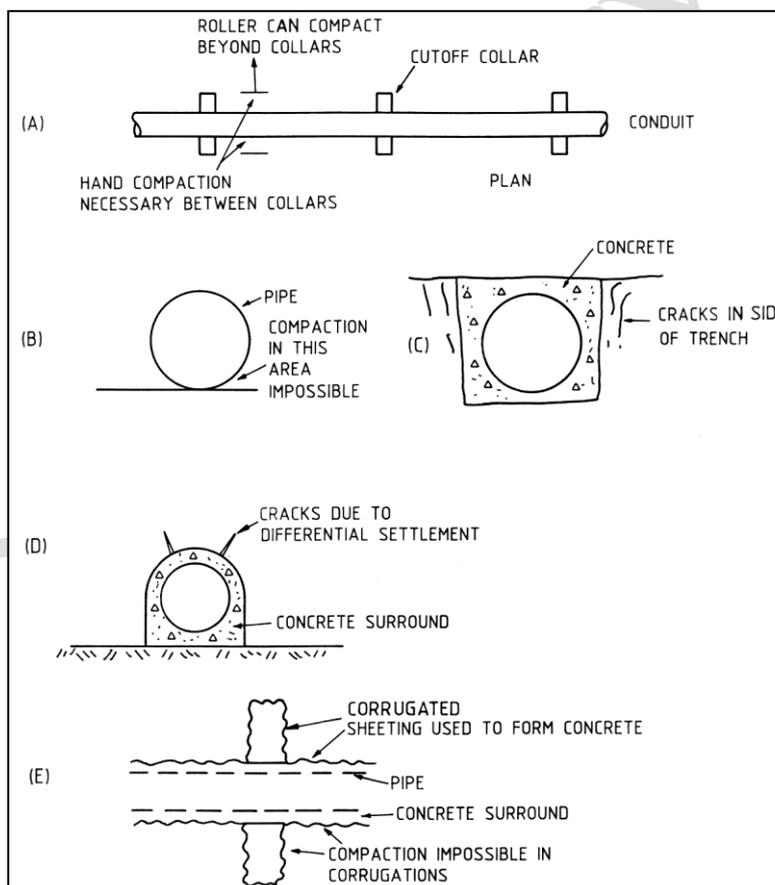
Some causes of internal erosion around conduits: (A) Inadequate compaction due to the presence of cut-off collars; (B) Inadequate compaction under pipe; (C) Cracking in soil or extremely weathered rock in the sides of a trench; (D) Cracks due to differential settlement; (E) Use of corrugations or other roughening of the surface of cut-off collars or concrete surround. (Fell et al 2005).
